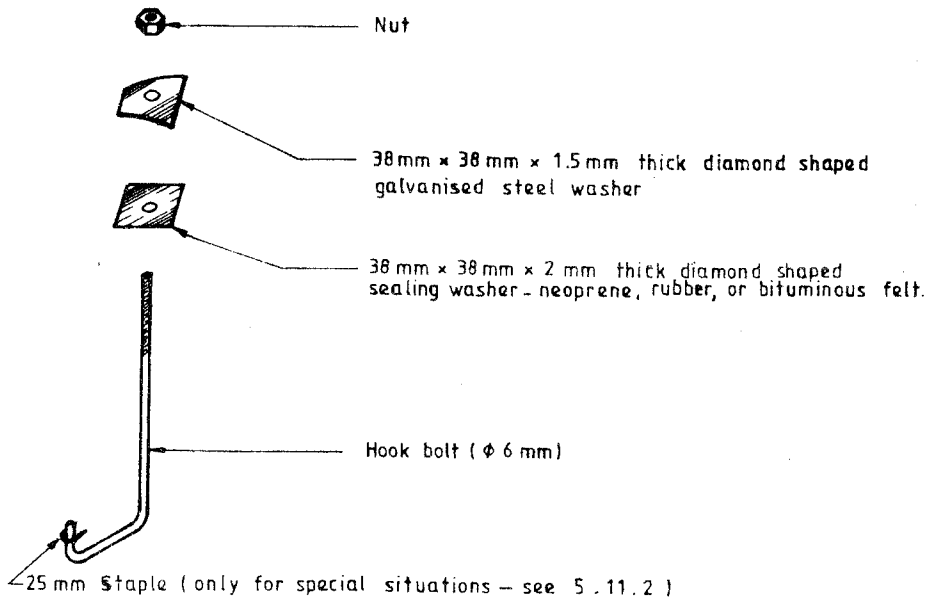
Standard type hook bolt and washer assembly - exploded view
